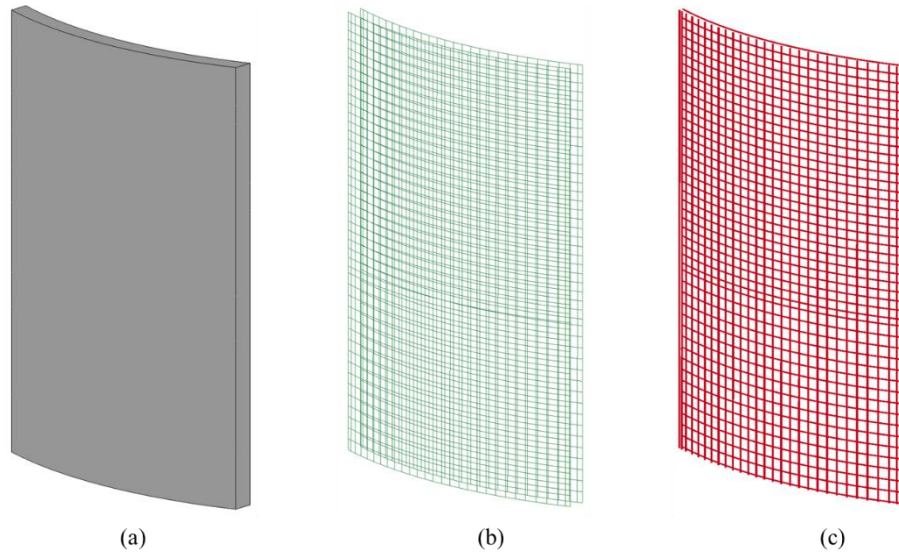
FE model of the pontoon wall: (a) concrete, (b) rebar and stirrup, and (c) tendon.
